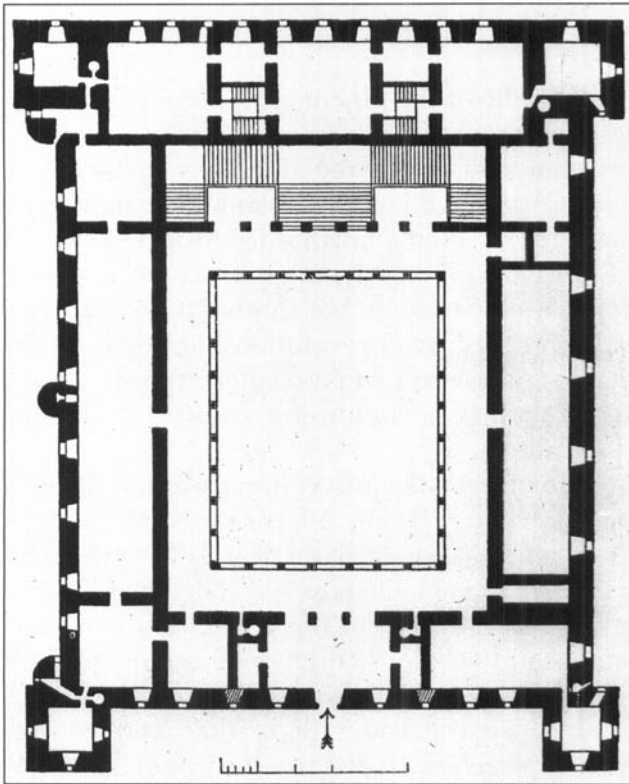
Alcázar, Toledo, plan of the ground floor.
